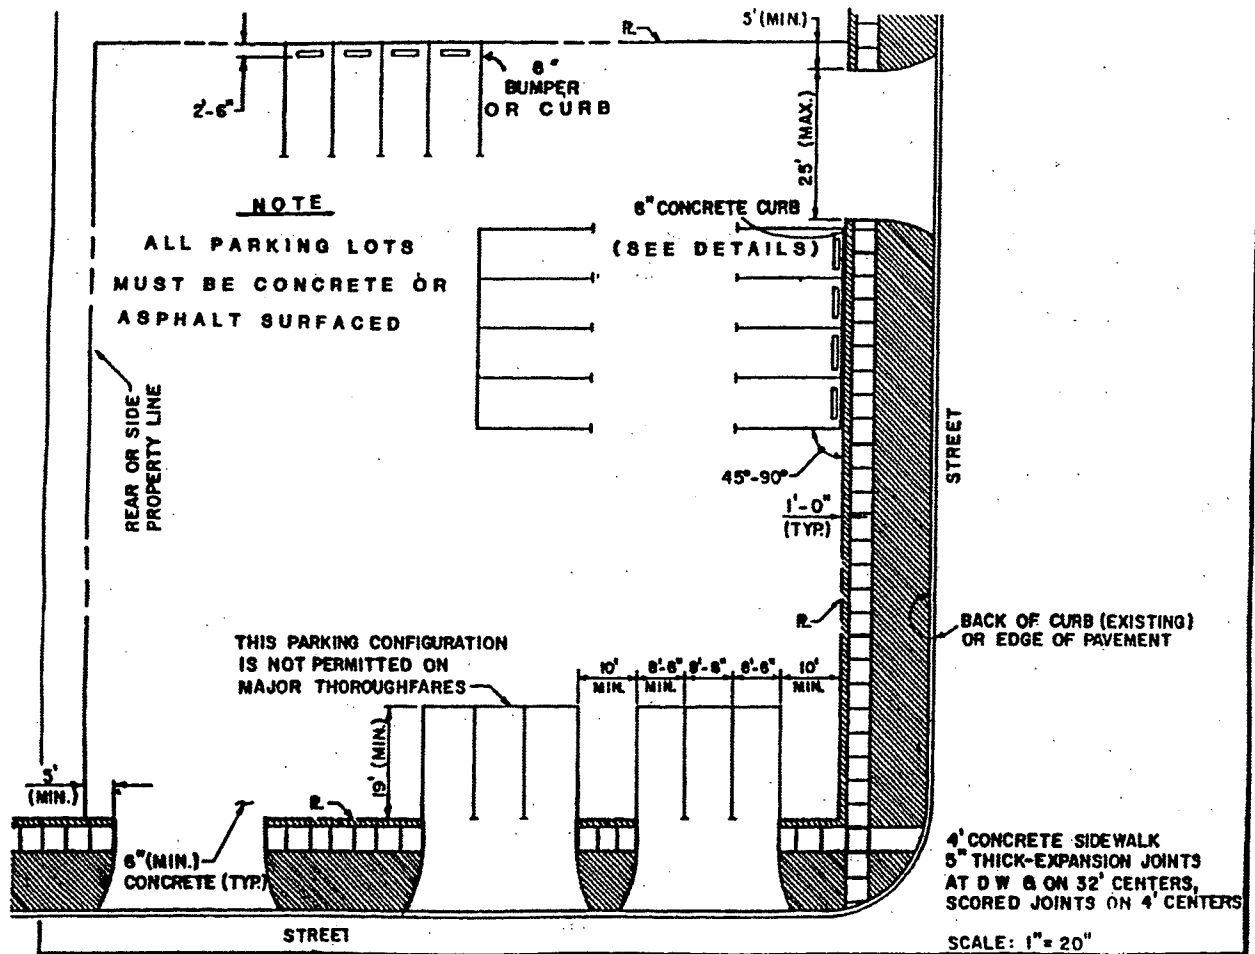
PARKING DESIGN DETAILS—SPATIAL STANDARDS
